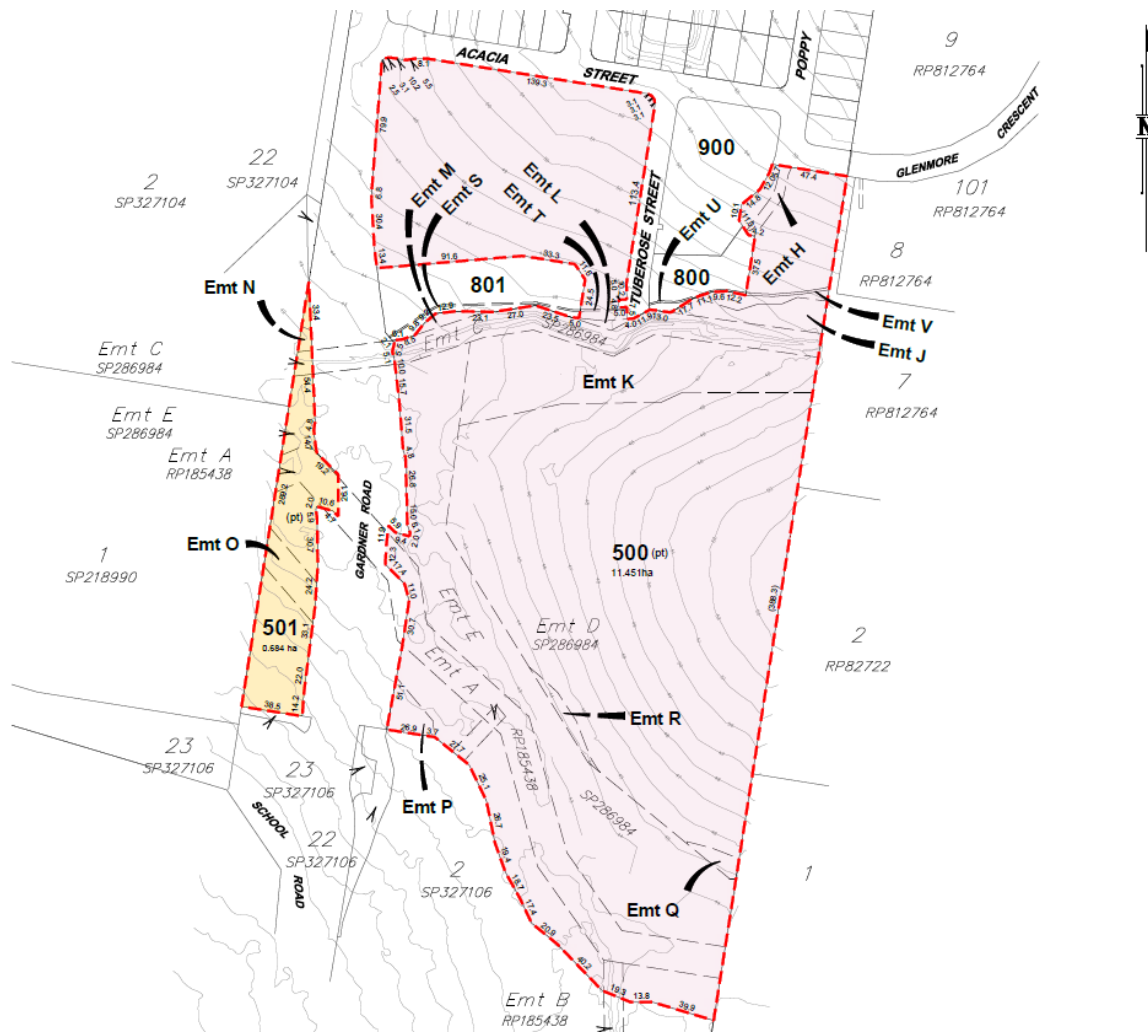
Proposed Subdivision Layout (Bennett and Bennett, 2026)
